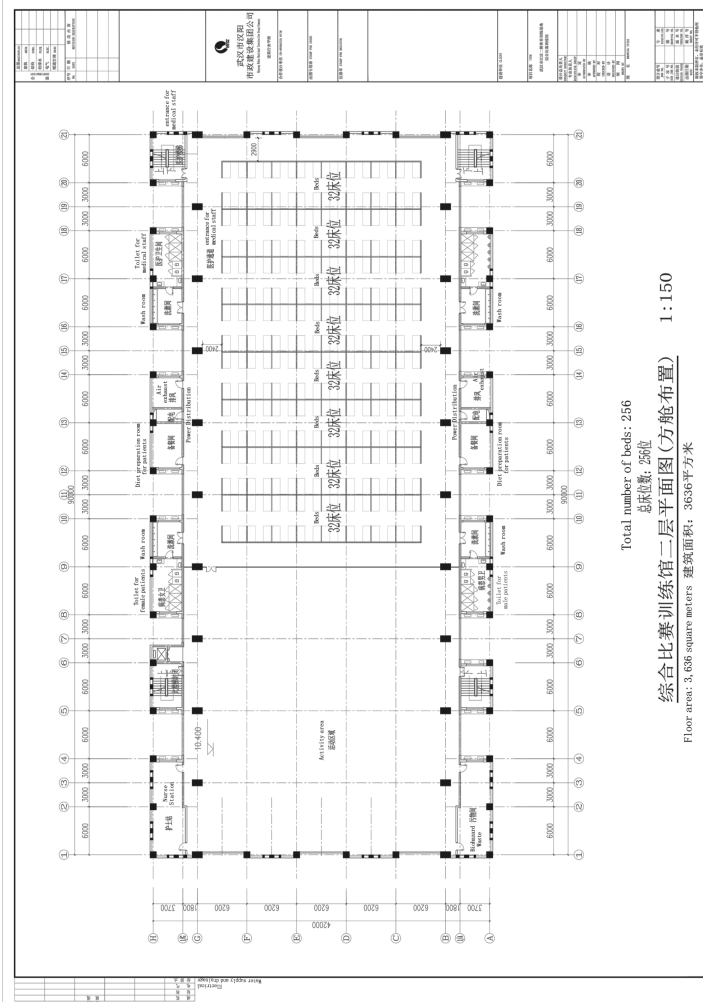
Plan of Hanyang Fangcang Shelter Hospital Floor 2
